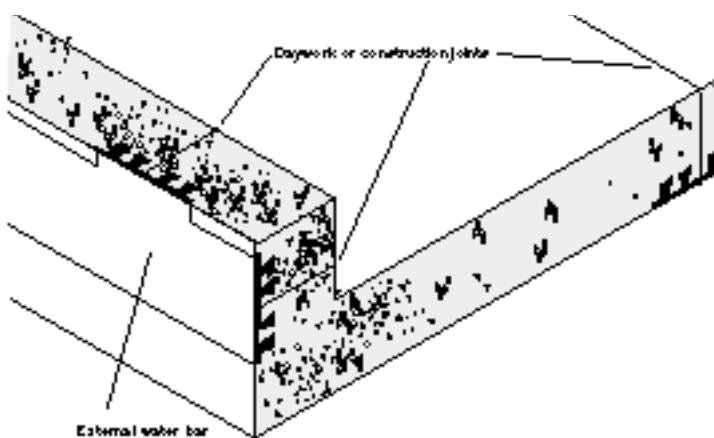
Dovetail section rubber or plastics strip cast into the shuttered face of the pour
